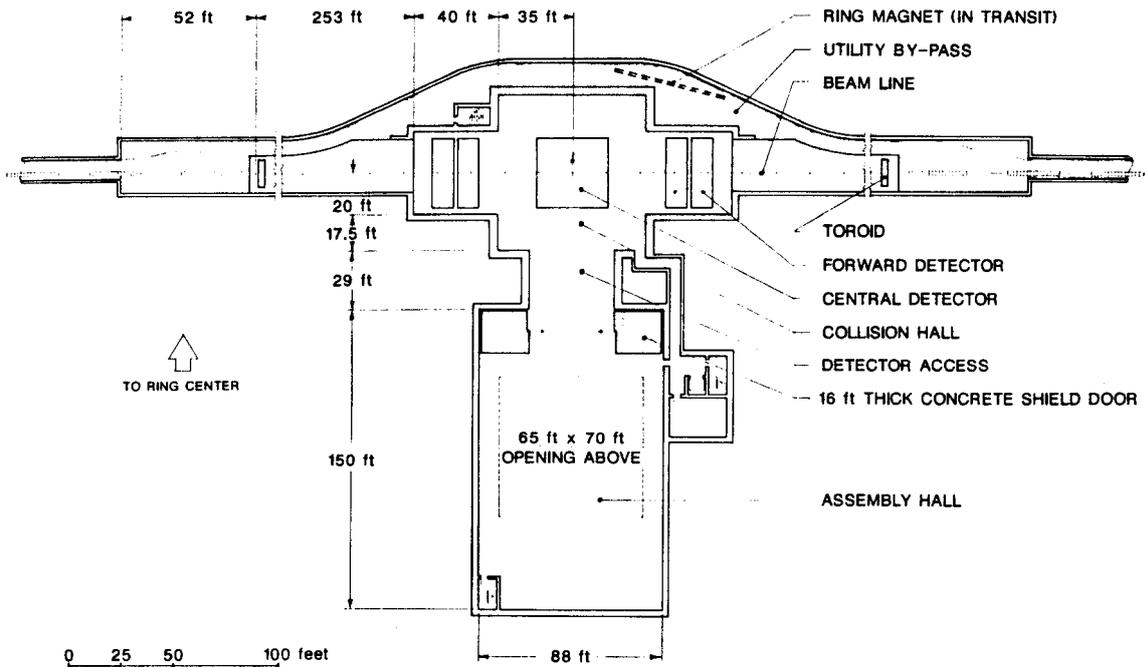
Plan view of possible medium- β collision hall with assembly area, showing collision hall, access way, shield doors, and staging building.
